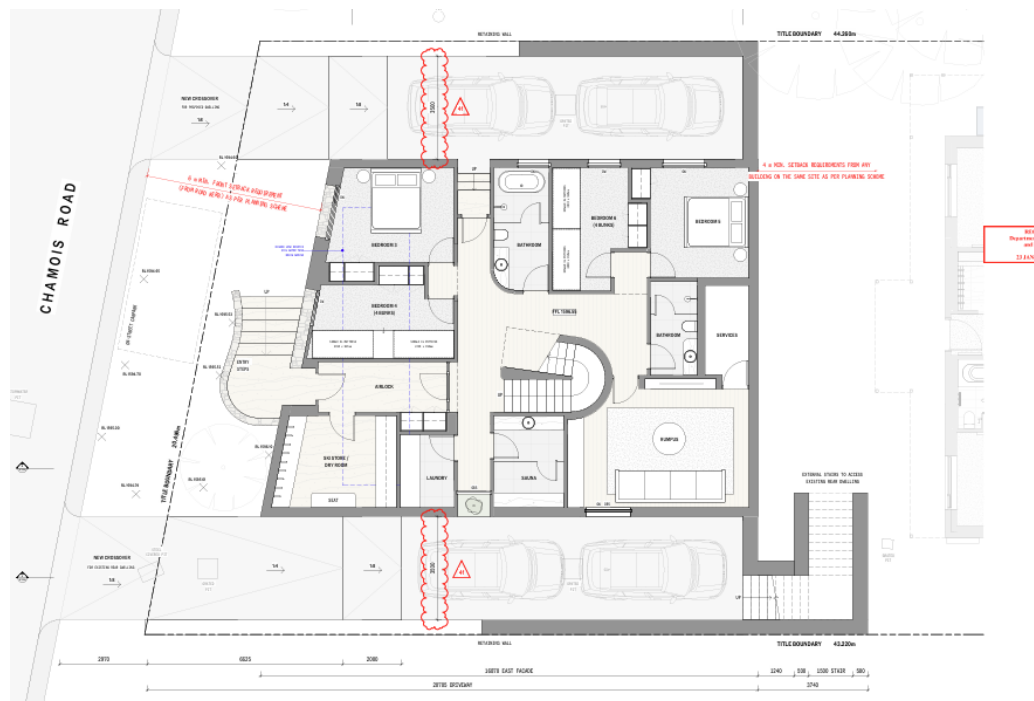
Ground floor plan and retaining walls – (Source: Application)
